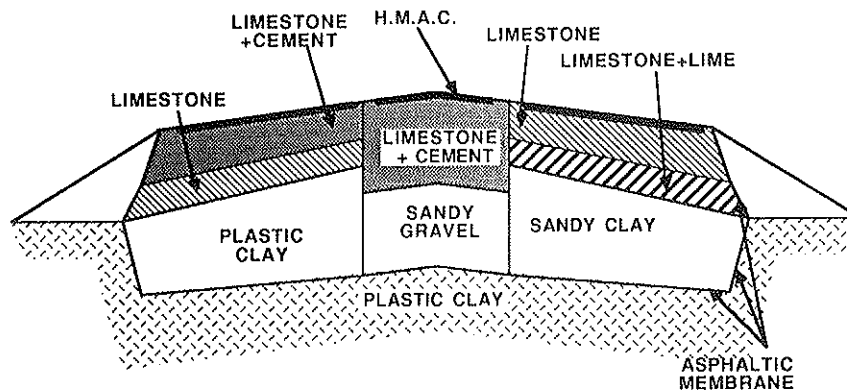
General layout of pavement test facility at Texas Transportation Institute.
